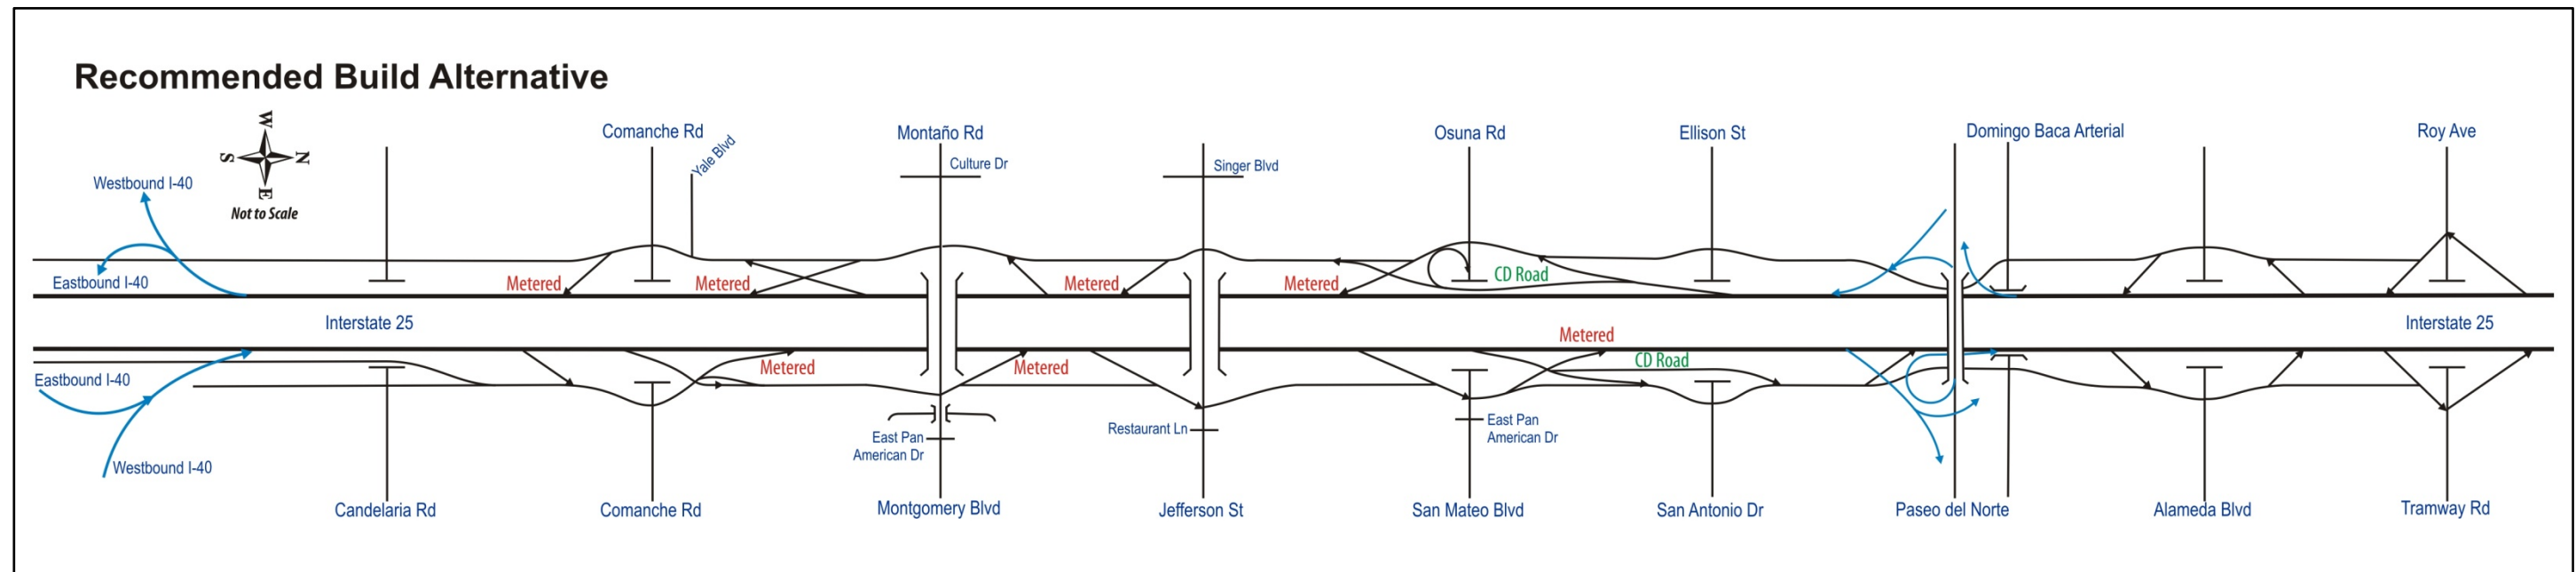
, Ramp Layout Schematic for the Recommended Build Alternative
